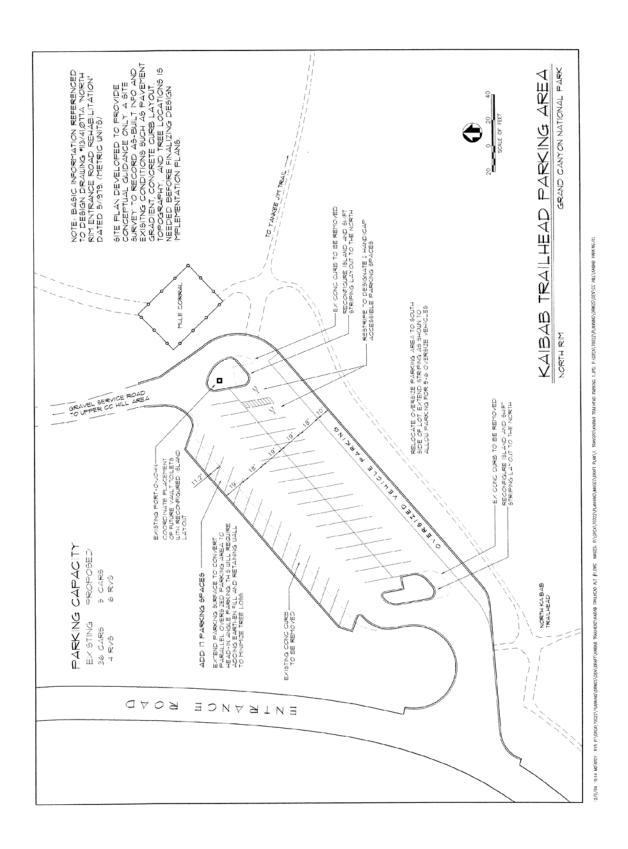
Development Plan Component, Kaibab Trailhead Parking Area
